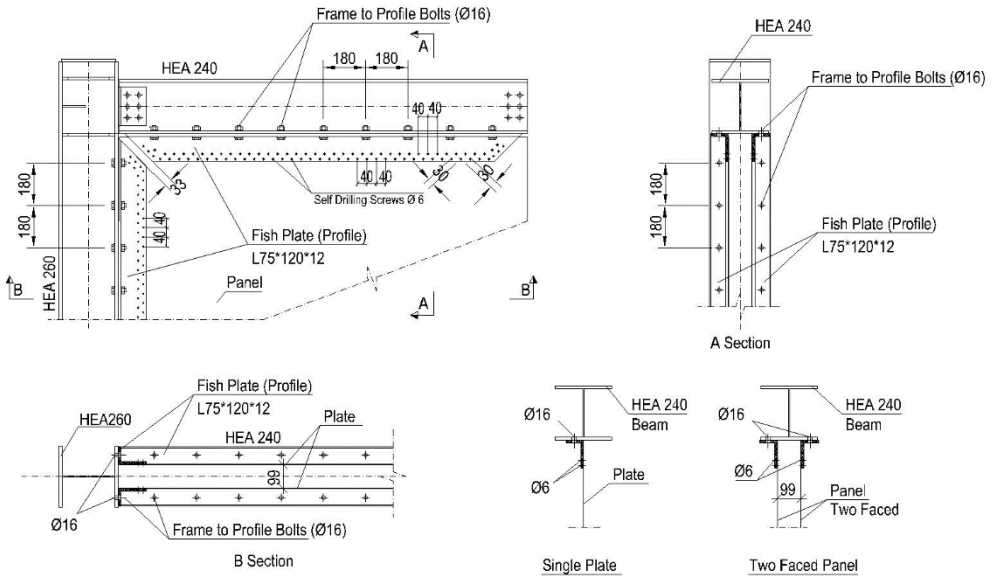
Infill plate/panel to frame connection detail (all dimensions are in mm)
